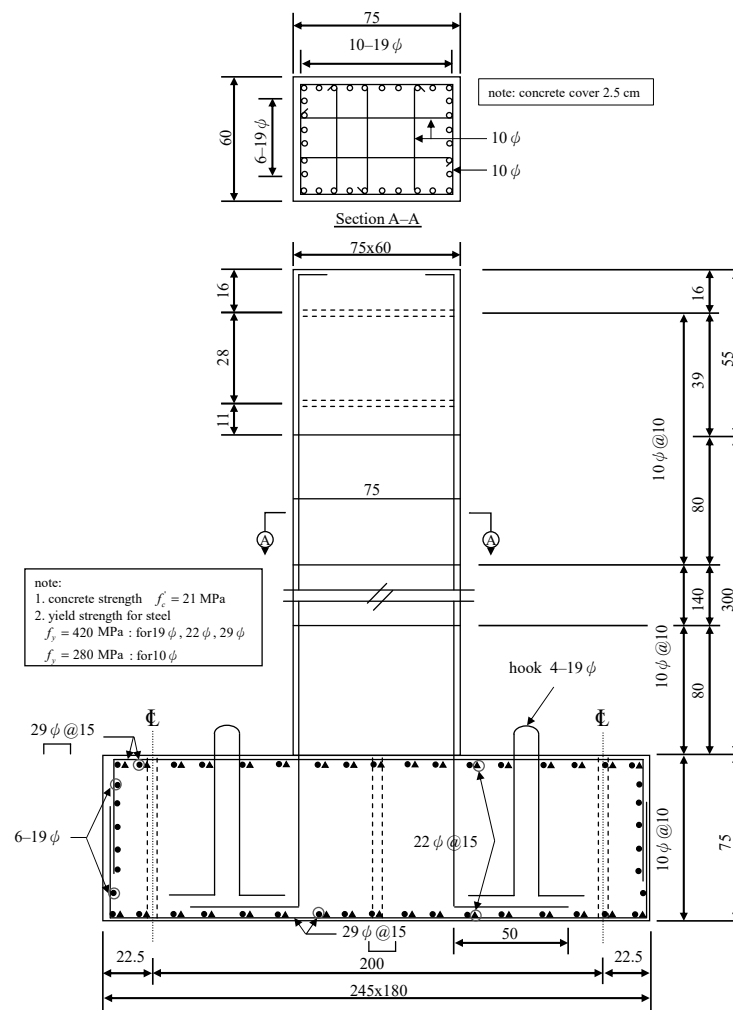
Geometry and reinforcement details of the bridge pier specimens.
